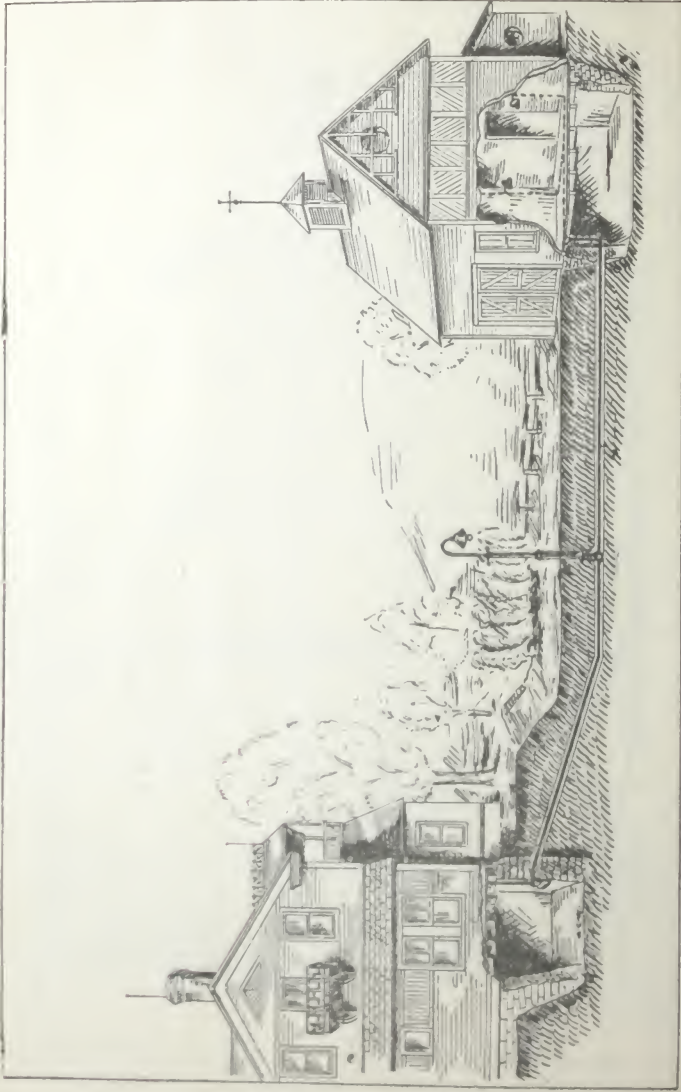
Illustrates the use of Conduit under ground. In this case it is placed in a wooded box and surrounded with pitch or asphalt.
